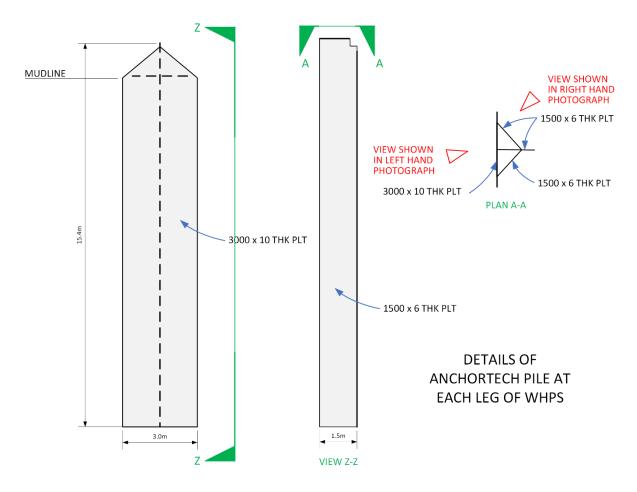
Well P1 WHPS 'Anchortech' piles (4x)
